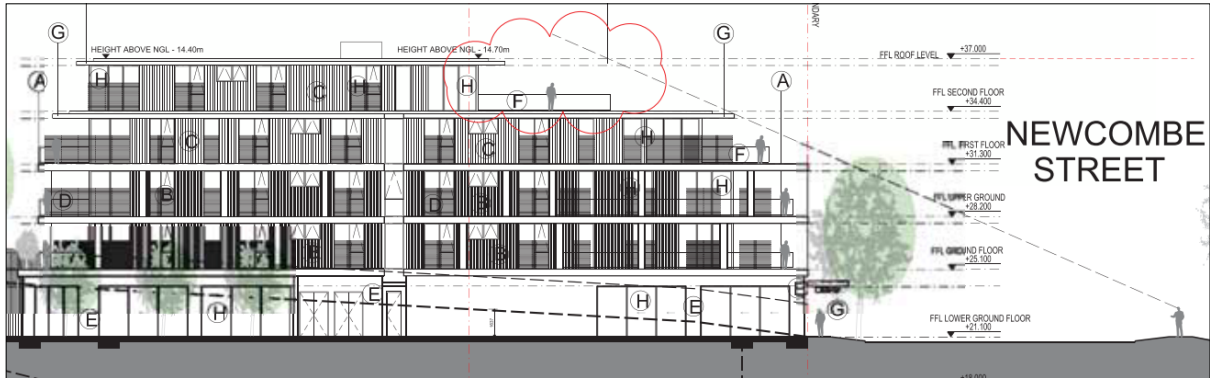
East Side Elevation Showing Upper Level Recessing from Newcombe Street
